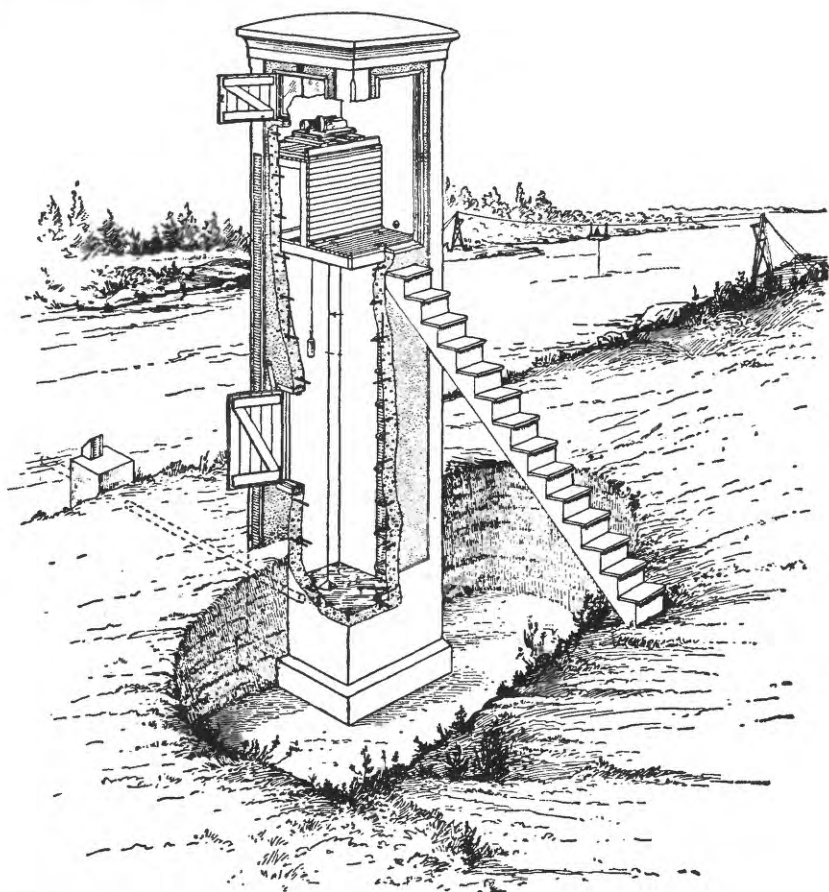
Typical river-measurement station showing concrete well and house for water-stage recorder and staff gages, cable, and car.
